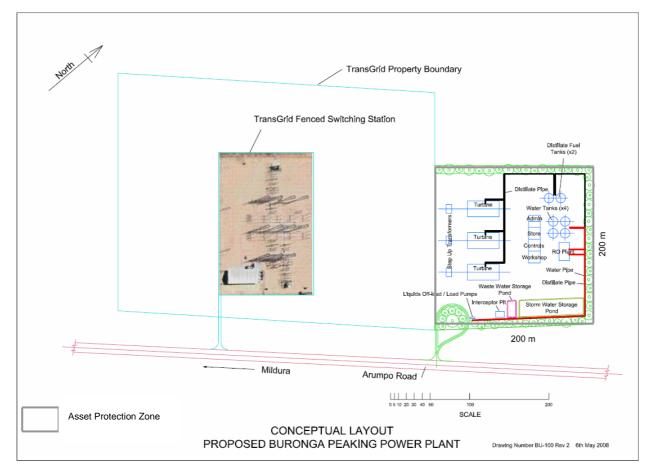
Proposed Concept Layout and Asset Protection Zone
